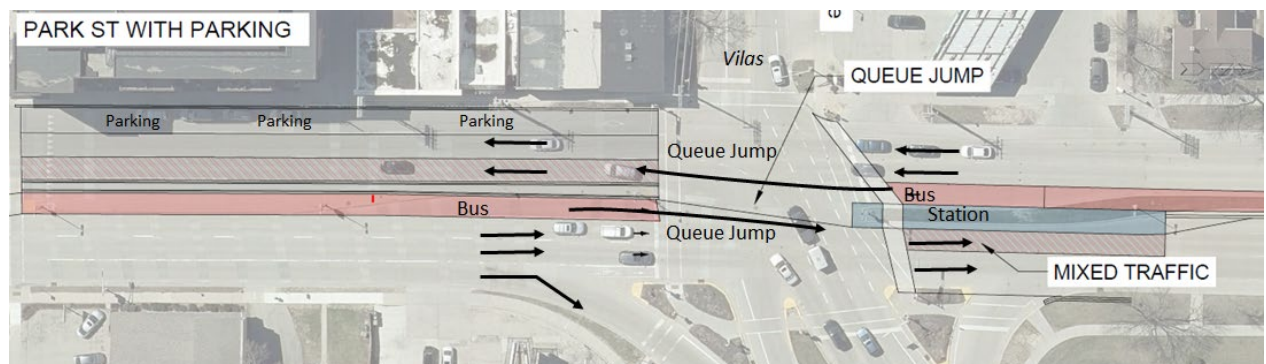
Parking Maintained Concept – West Washington Intersection
